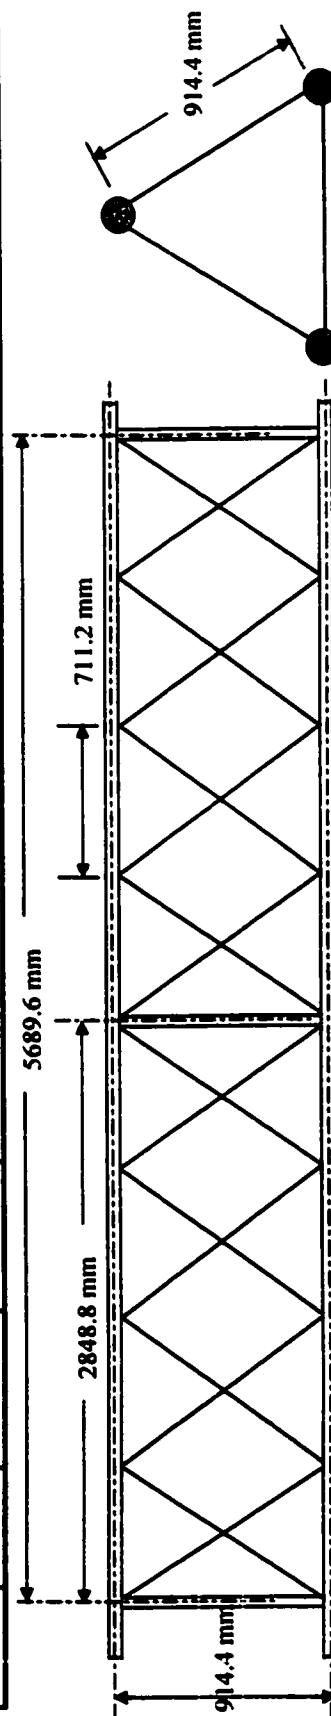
DIMENSIONS OF 8-PANEL SPECIMEN
